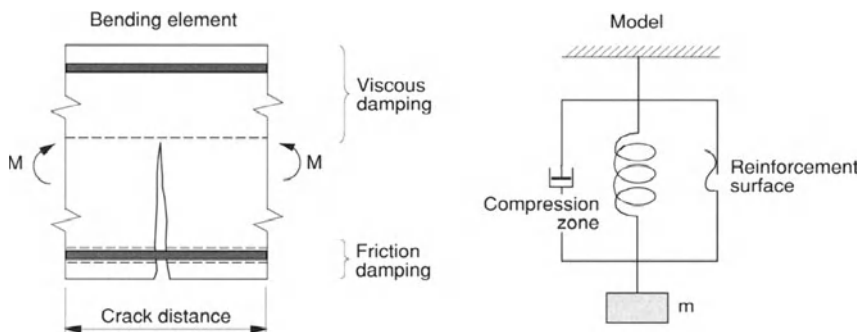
Cracked bending element and relevant model for material damping of reinforced concrete [C.2]
